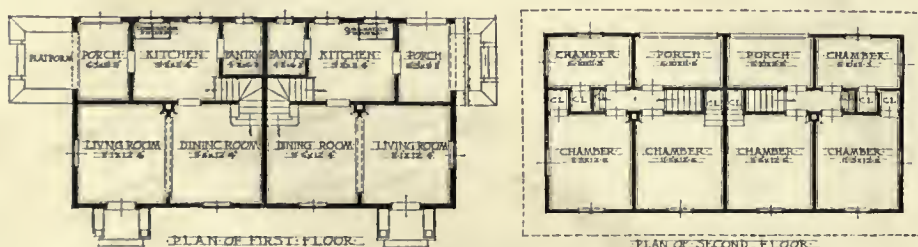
First and Second Floor Plans, Nanticoke Concrete Houses
